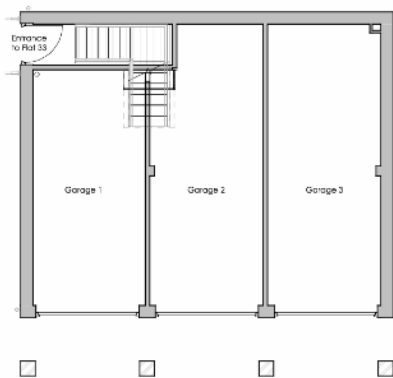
Existing Floor Plan - (Garage to which works are being undertaken identified as 'Garage 1')
